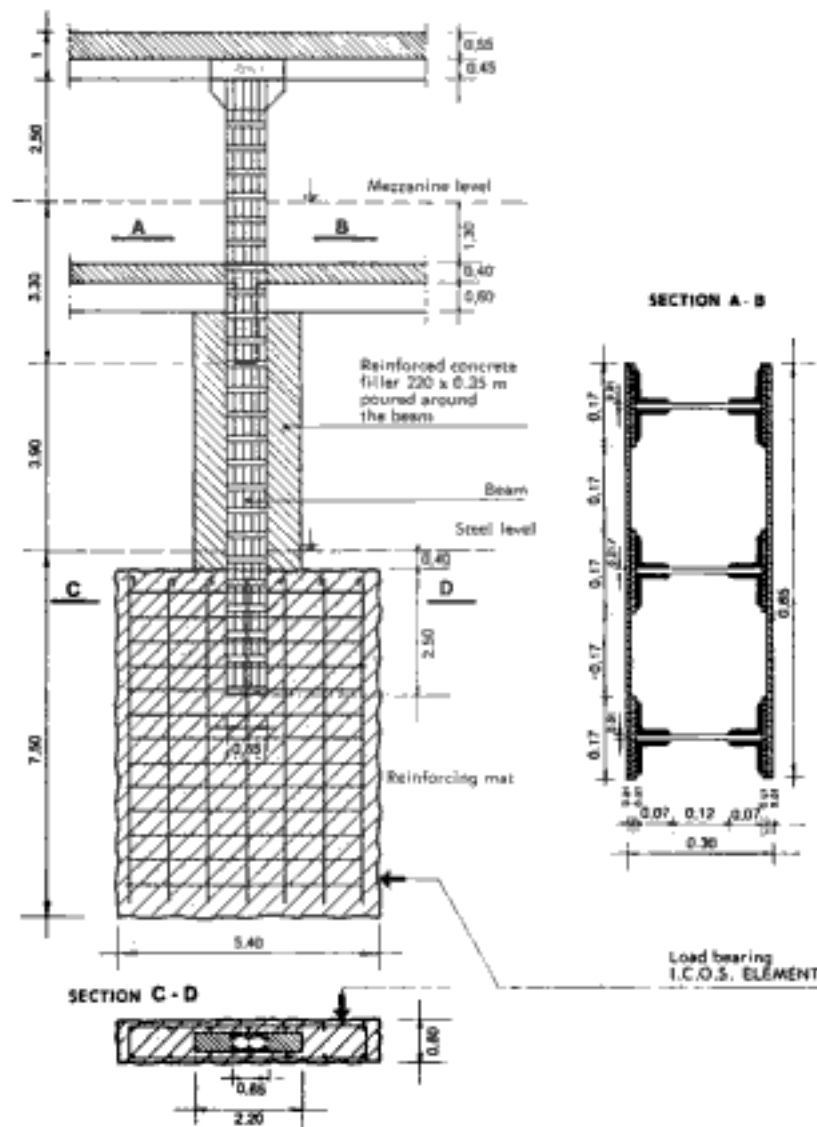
Milan Metro: cross-section of fabricated steel columns cast into reinforced concrete base using diaphragm wall techniques for vertical load-bearing units (courtesy of Icos)
